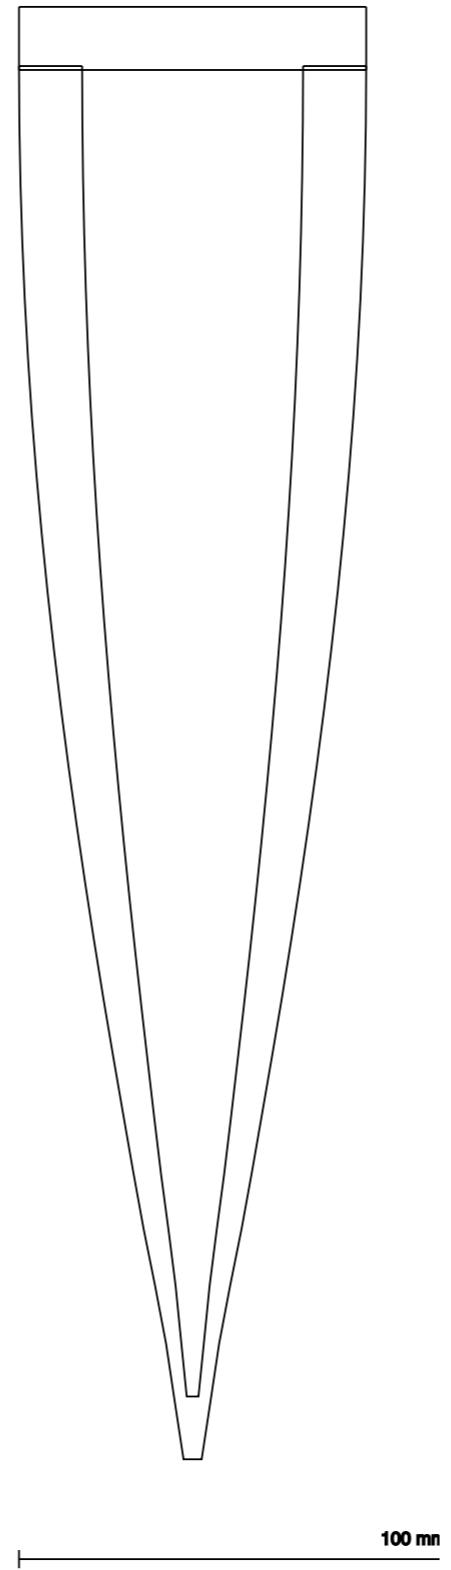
Body Plan—Section at stn_6 (Y=3050mm)
